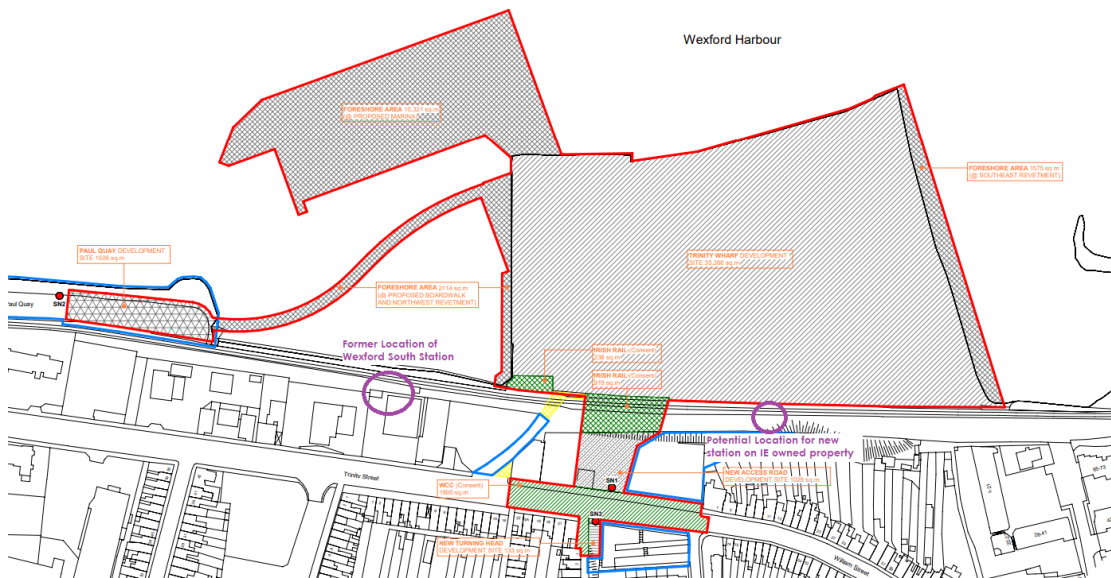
Proposed Trinity Wharf Plan with potential Station location (Source: Wexford Co. Co)
